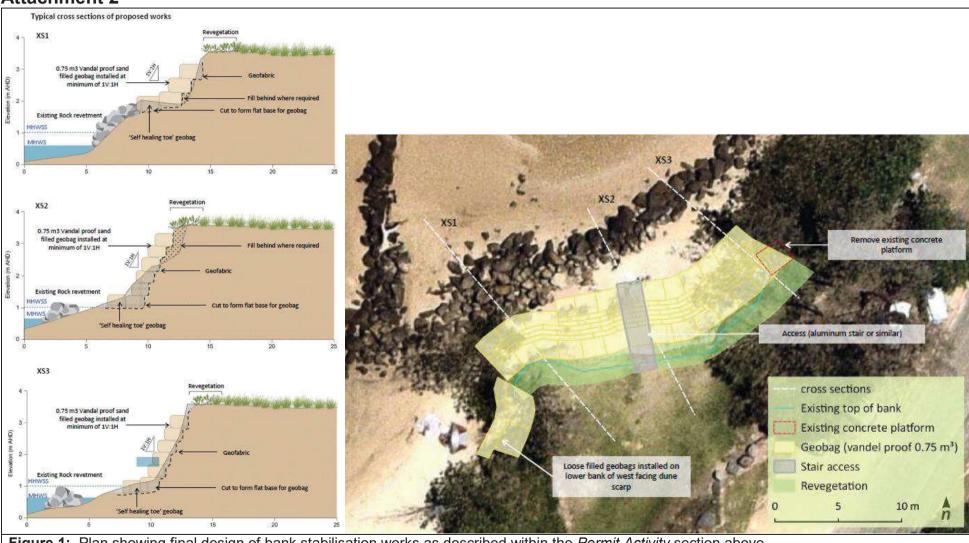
Plan showing final design of bank stabilisation works as described within the Permit Activity section above.
